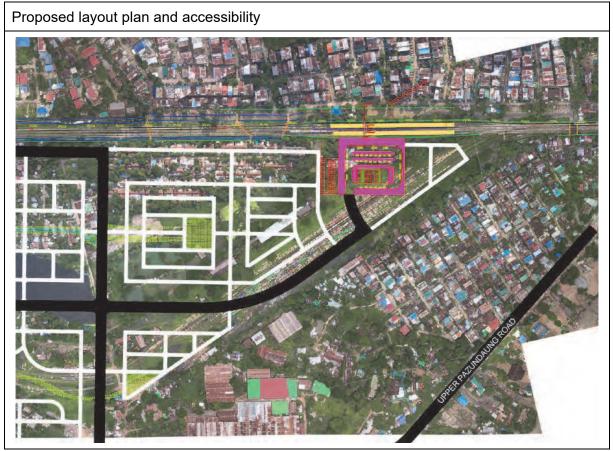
Existing and Proposed Layout Plan (Ma Hlwa Gon Station)
